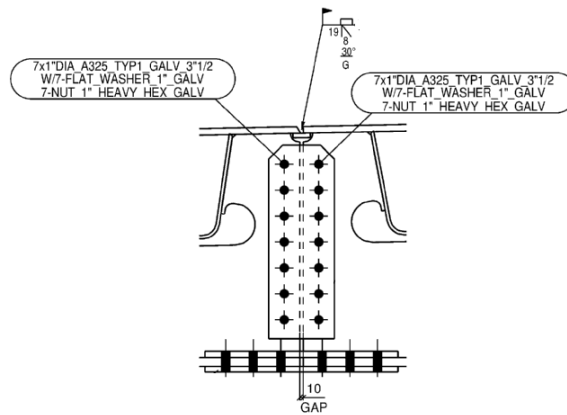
Welded longitudinal joint – Brighton Swing Bridge, 2018
